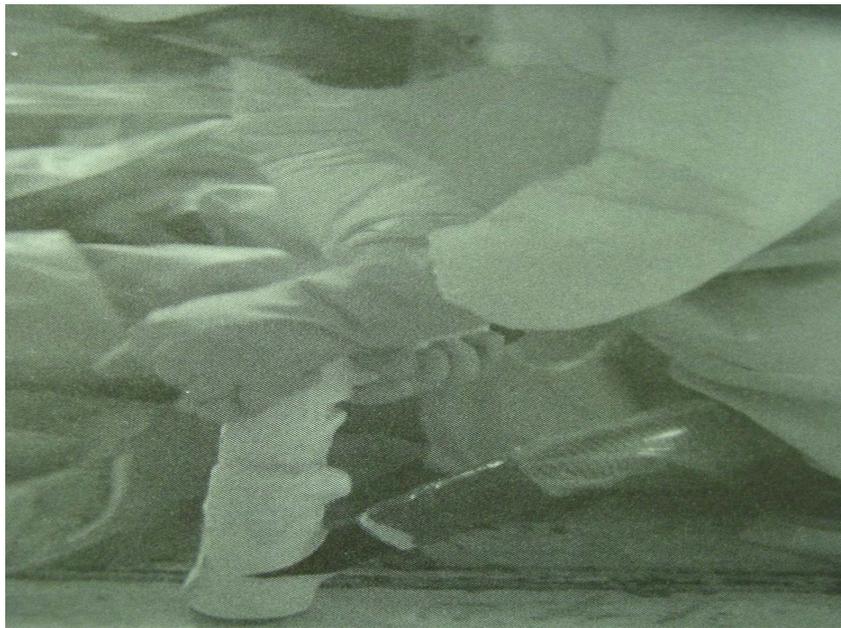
Technicians Using Hand Held Vacuum Equipped Scabbler to Remove Fixed Radioactive Contamination.
